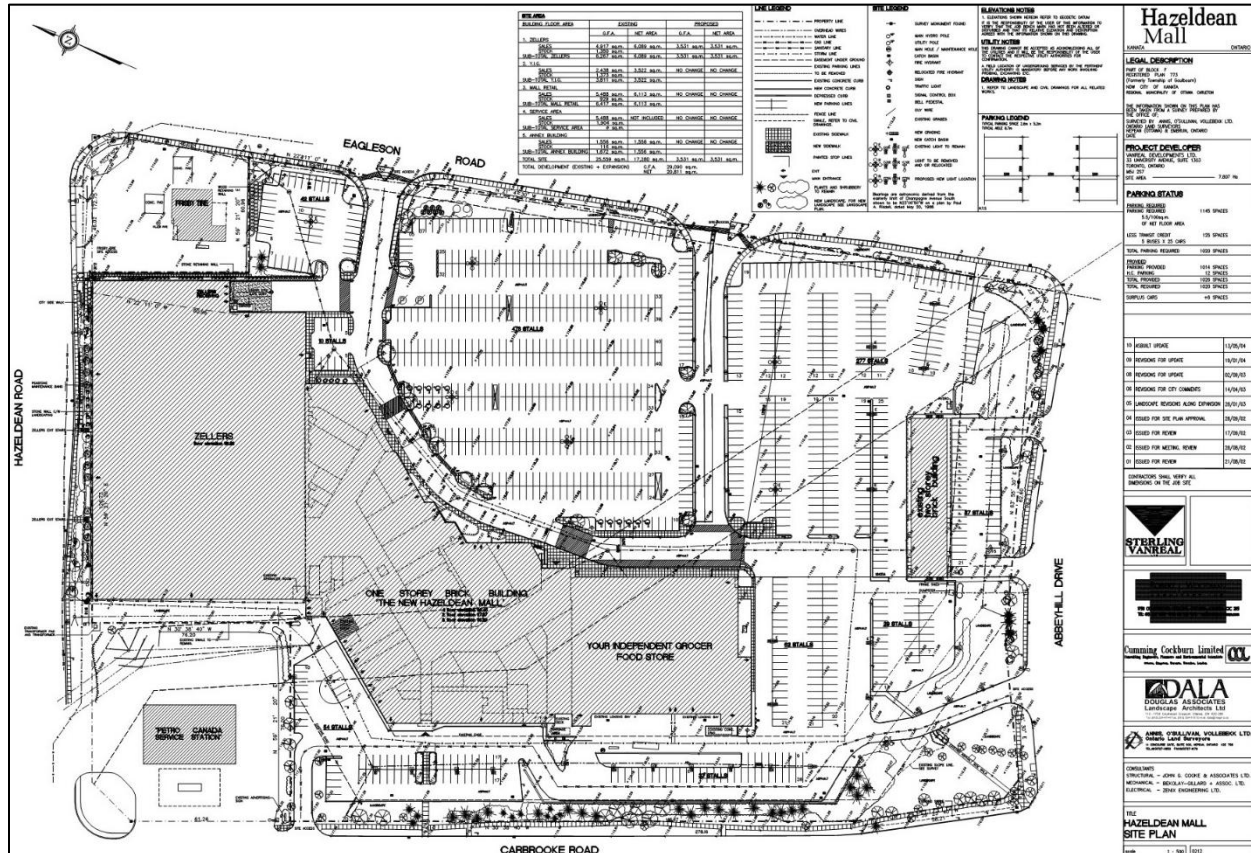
Excerpt from Site Plan prepared Robert J. Woodman Architect Inc., Drawing SP.01 REV 10 dated May 13, 2004.
